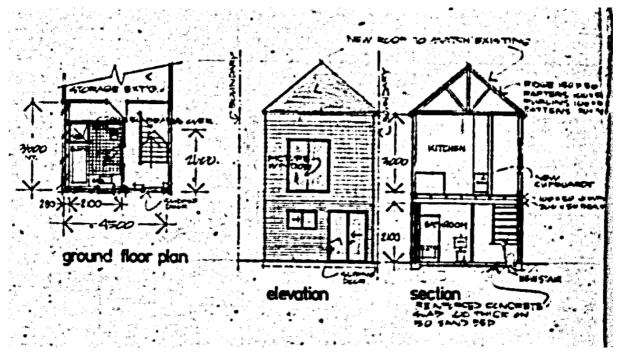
Building Application dated 1981 showing rear additions and lower ground floor alterations.
